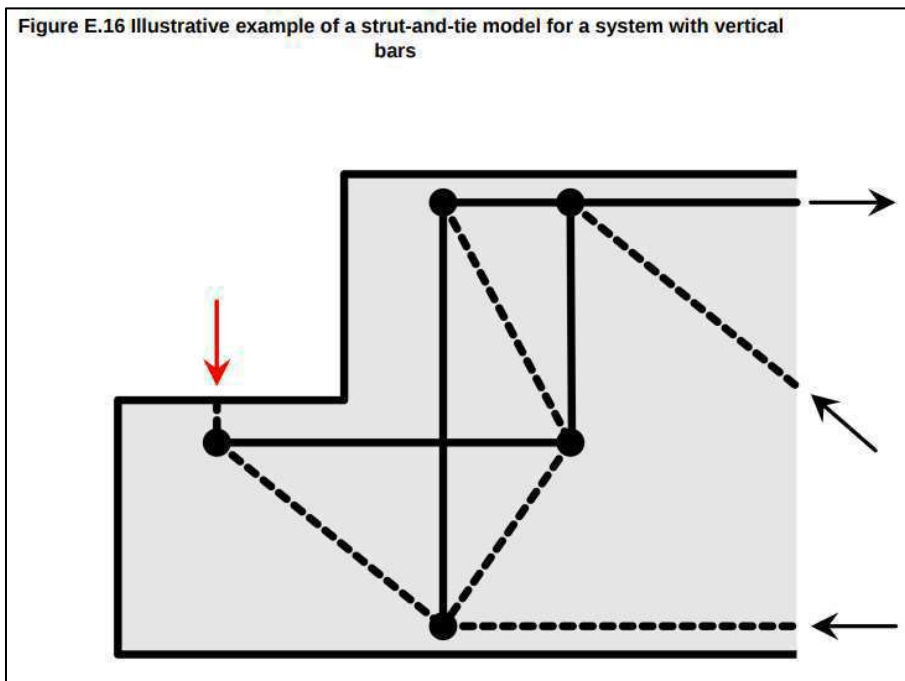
of CS 466 – Idealised strut and tie model for lower nib considering no diagonal reinforcement.
